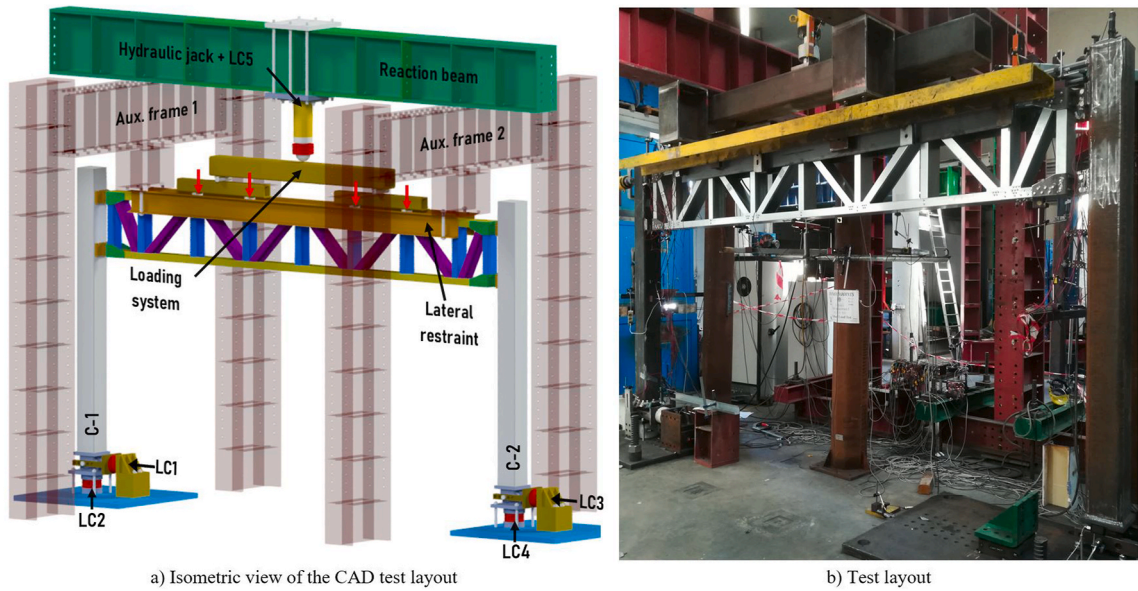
Experimental layout of the isolated sub-frames subjected to vertical load.
